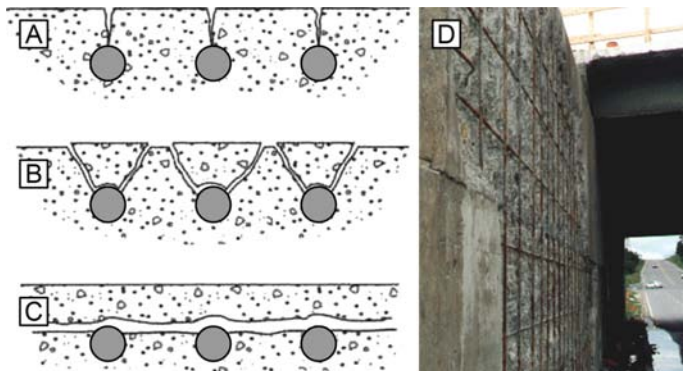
Damage types resulting from reinforcement corrosion in oxygen-rich concrete. [A]: Cracking. [B]: Spalling. [C]: Delamination. [D]: Combination of damage types at concrete bridge. After [SSR, 2007].
